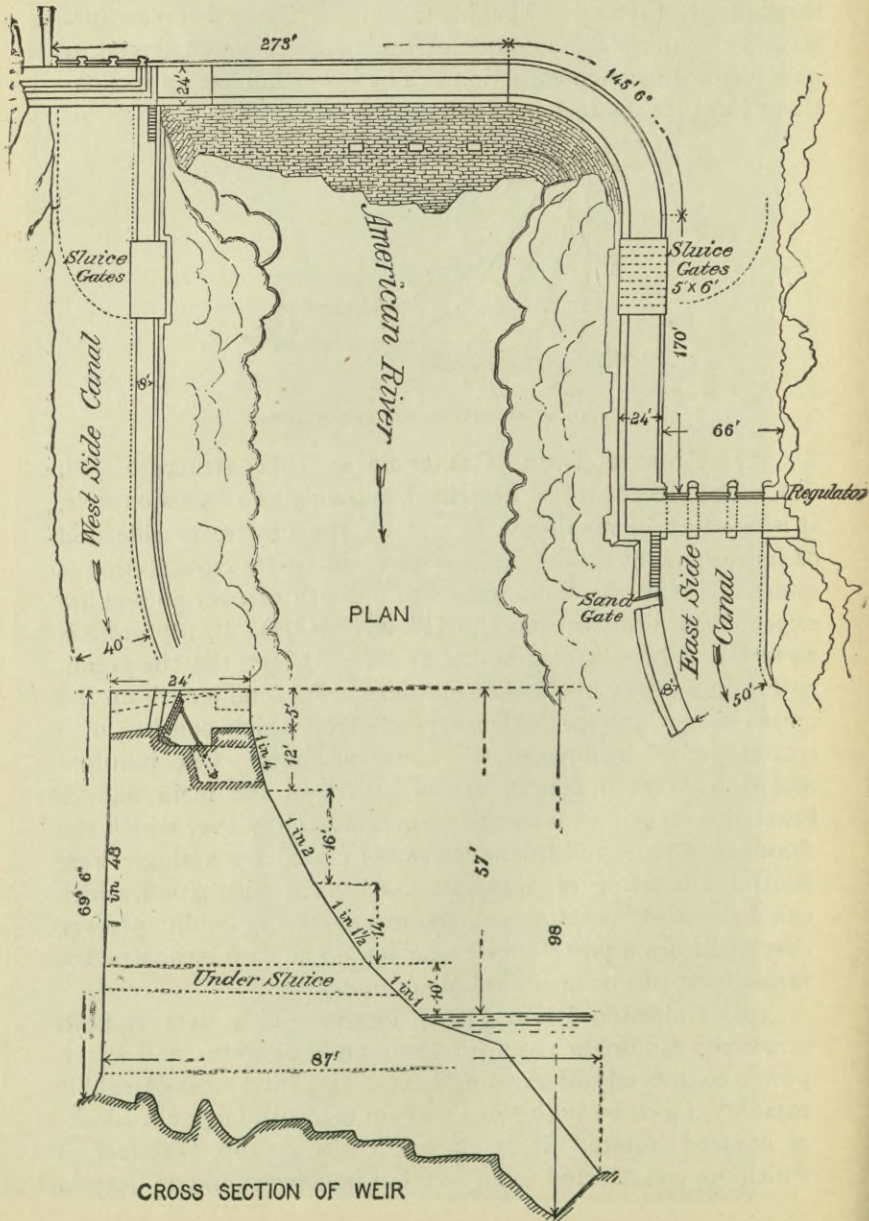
PLATE XXXVIII.—FOLSOM CANAL, PLAN AND CROSS-SECTION OF WEIR.
